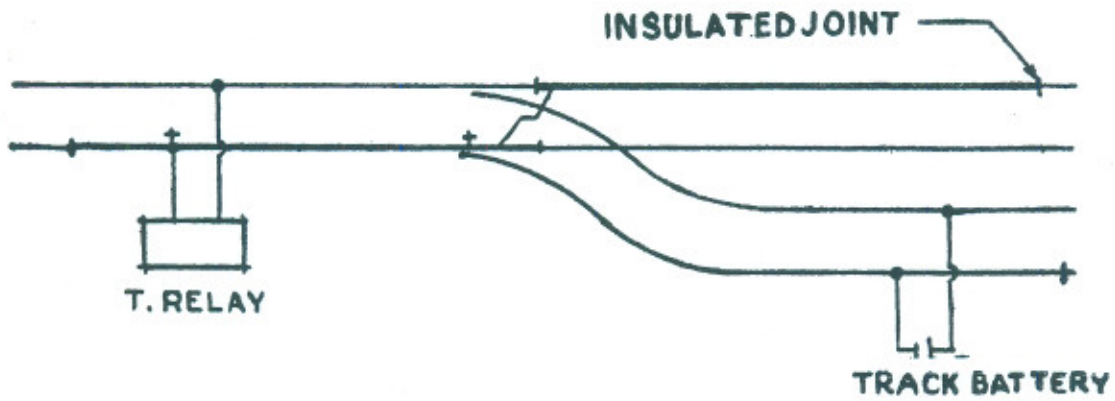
SINGLE RAIL TRACK CIRCUIT
